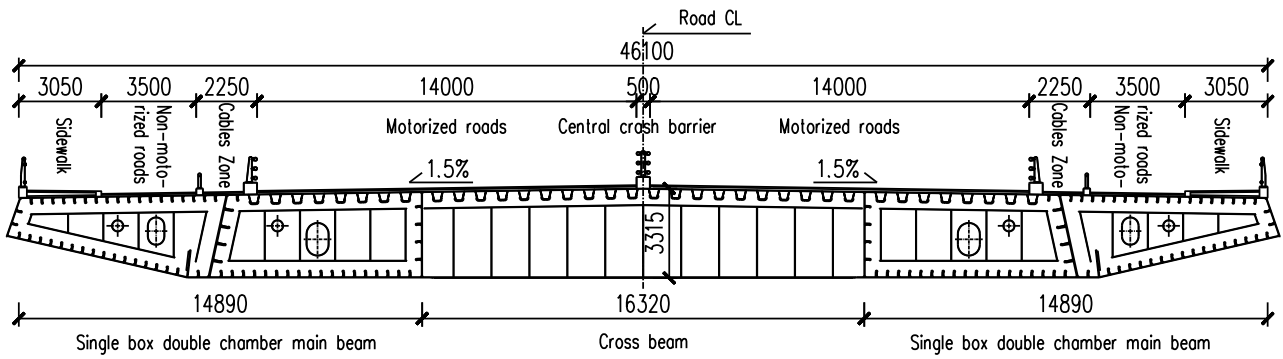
Cross-section of a standard segment of the cable-stayed bridge (Unit: mm)
